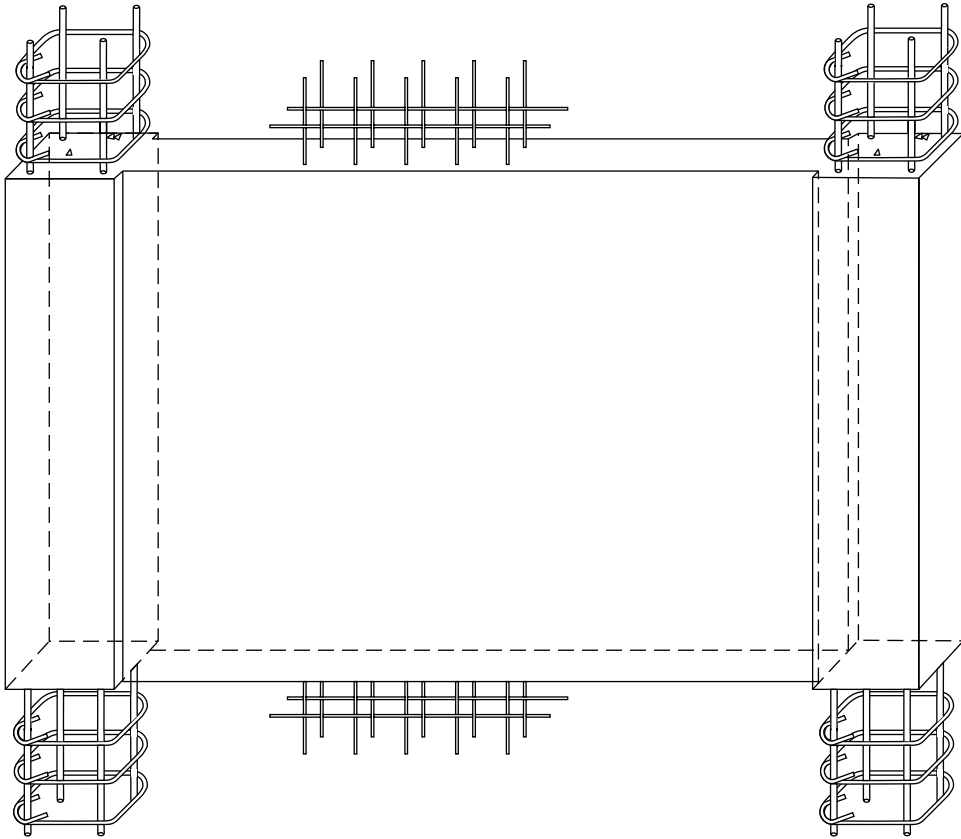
Reinforced concrete wall with boundary columns.
